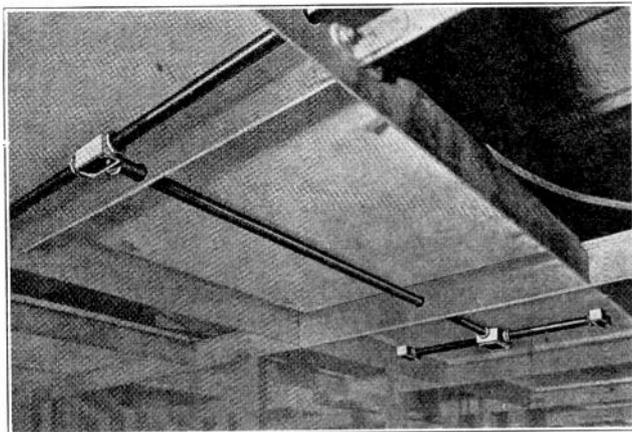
Section of an installation of electric metallic tubing with threadless fittings.
